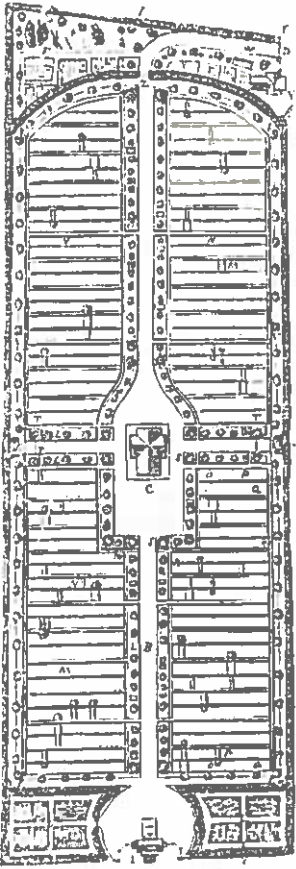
Plan of Loudon's design for the Cambridge Cemetery (*Author's Collection*)
